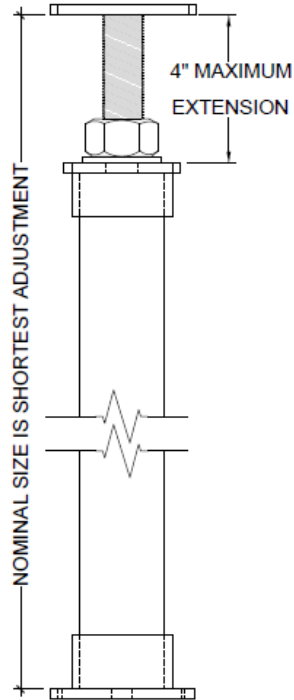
OVERALL SETTLESTOP FLOOR SUPPORT COLUMN ASSEMBLY
